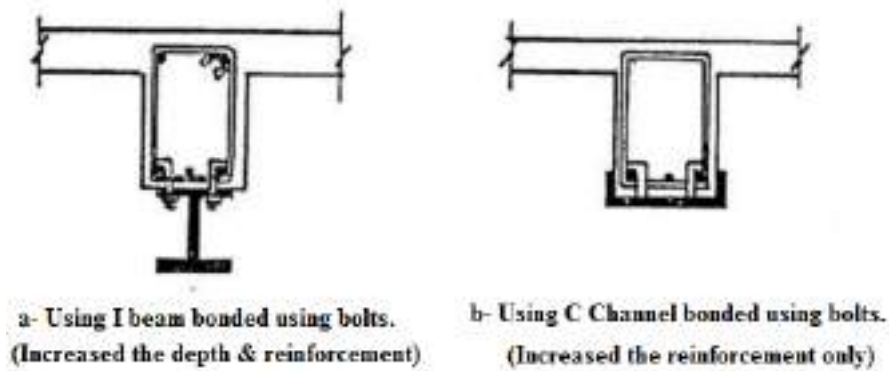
Addition of steel sections (Source: Abu Almjd, 1988)
